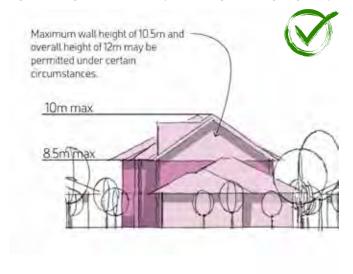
Single House and Grouped Dwellings - Building Height Example Diagram
